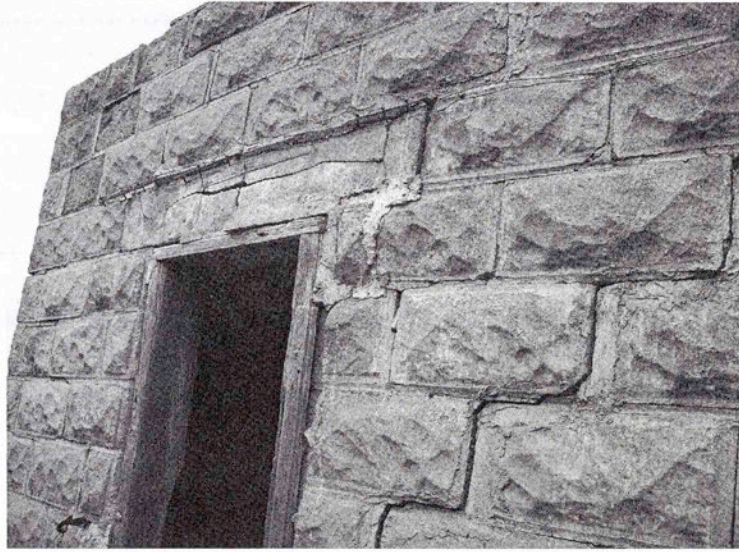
The Otto Bredel's blacksmith shop with *O Bredel* imprinted in stone above the door. (Photo by Lynda Ramsey)
